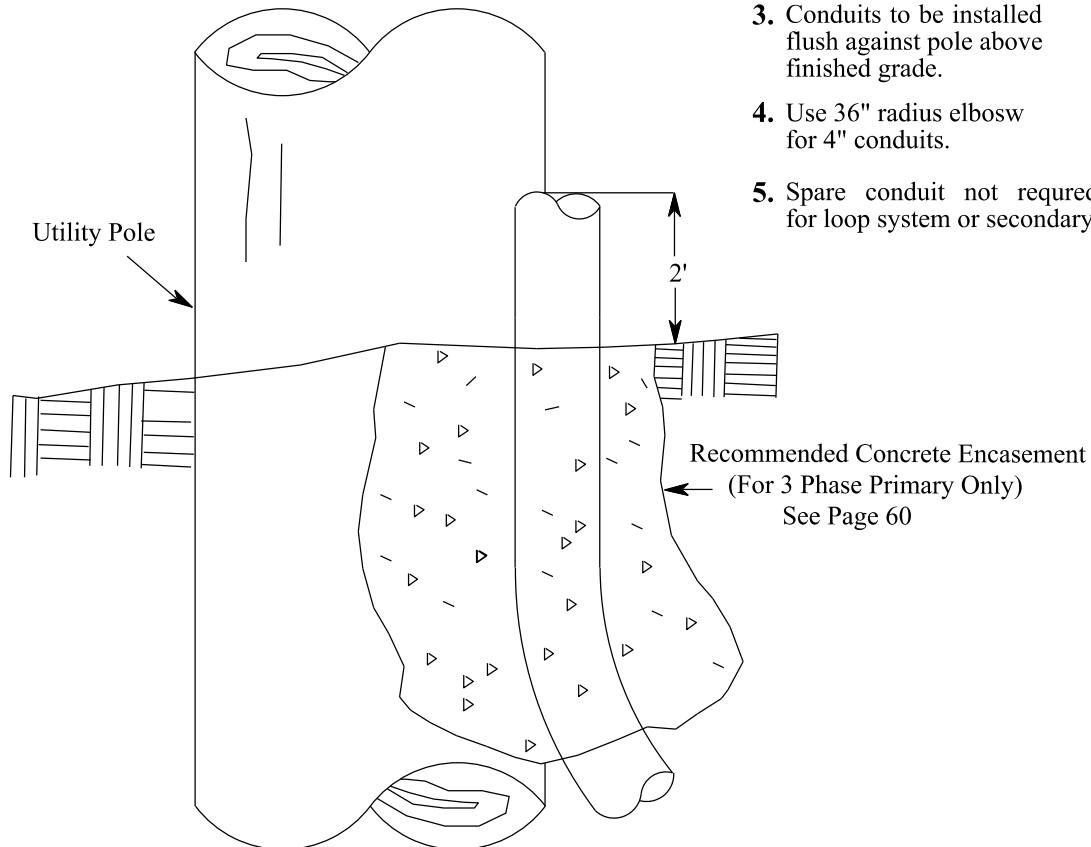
# DETAIL OF CONDUIT INSTALLATION AT PRIMARY OR SECONDARY RISER POLE
